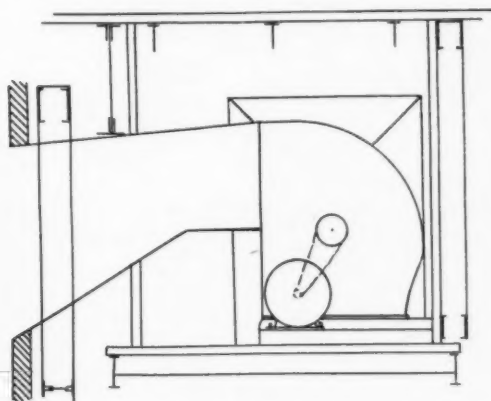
Elevation of the ventilating fan and duct leading to the auditorium ceiling.
